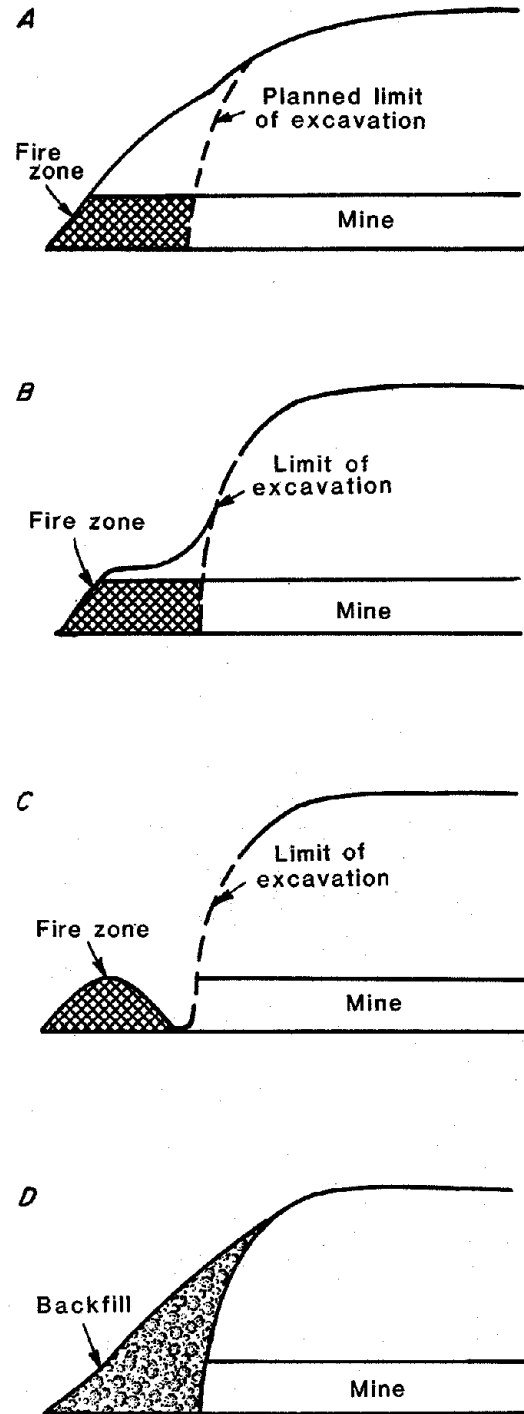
Schematic of excavation to mine fire to inhibit propagation. A, Preexcavation; B, first cut; C, isolated fire zone; D, excavation completed and backfilled.
